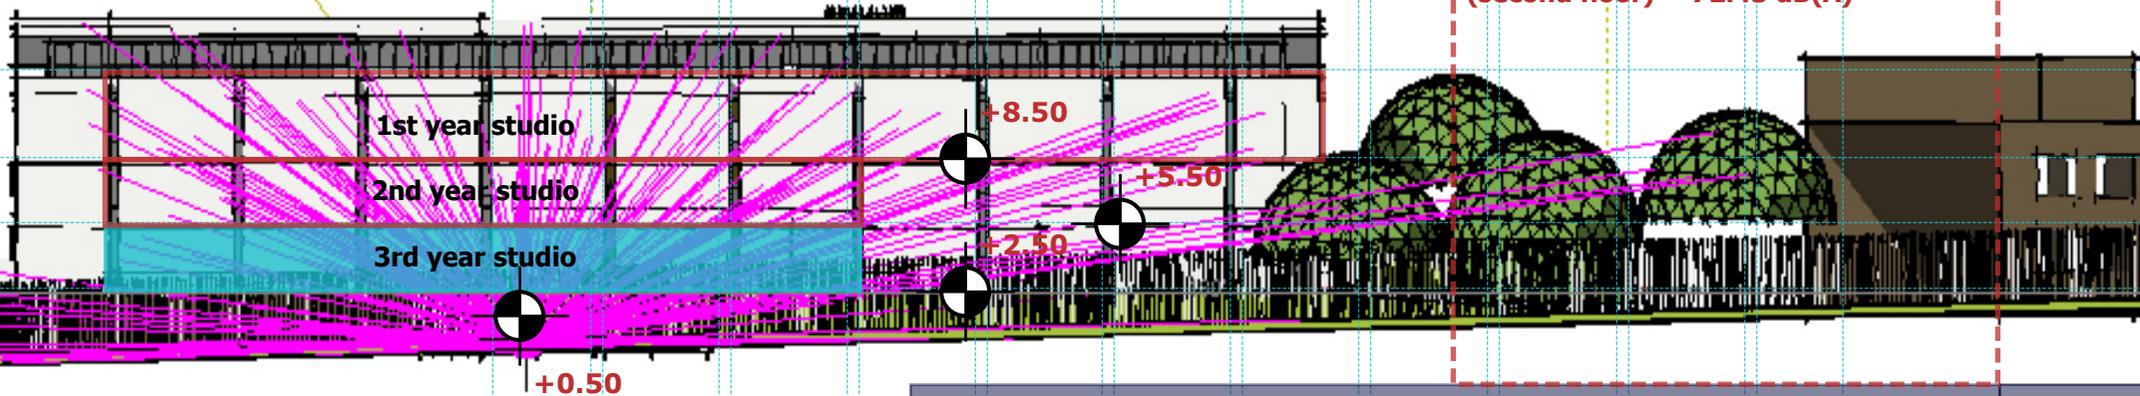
Boukunde II - South Elevation (Old weather building to the right)
